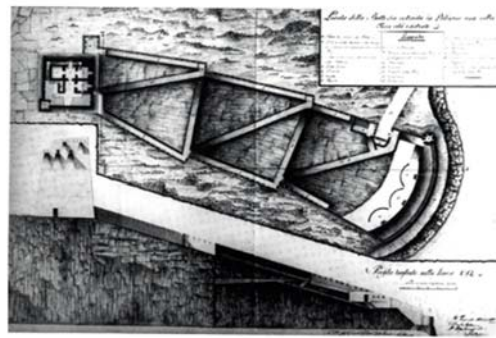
Plan of the battery constructed behind the Torre di Palinuro. (Russo F., 2009)
